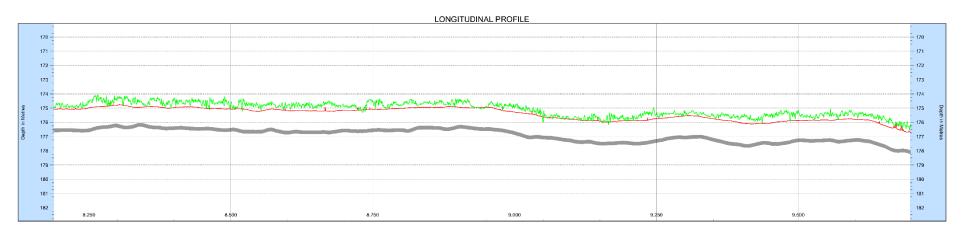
PL4556 As-built alignment sheet KP8.188 to KP9.698
